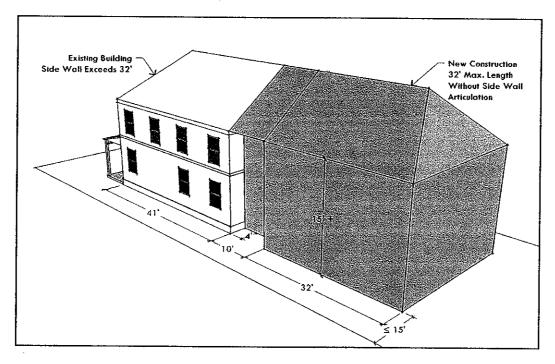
Side Wall Articulation (Existing Side Wall Exceeds 32 Feet)
